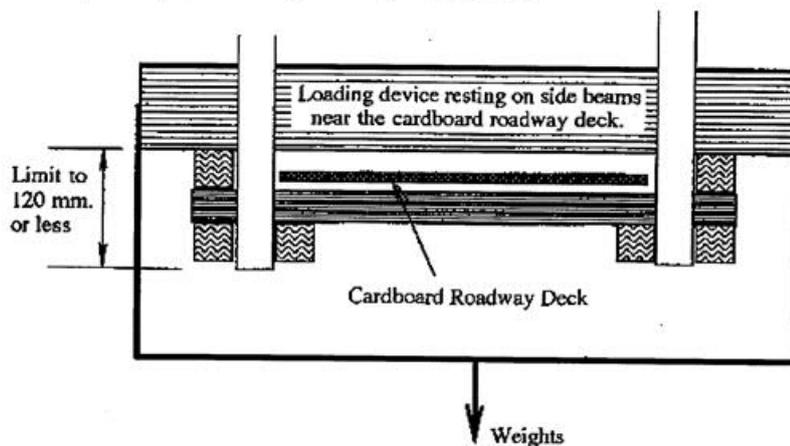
c - Section at Deck Level - Note that the Loading Device can rest on the side beam instead of on the cardboard deck. Note, the limit of 120 mm to underside of bridge. See above figure.
